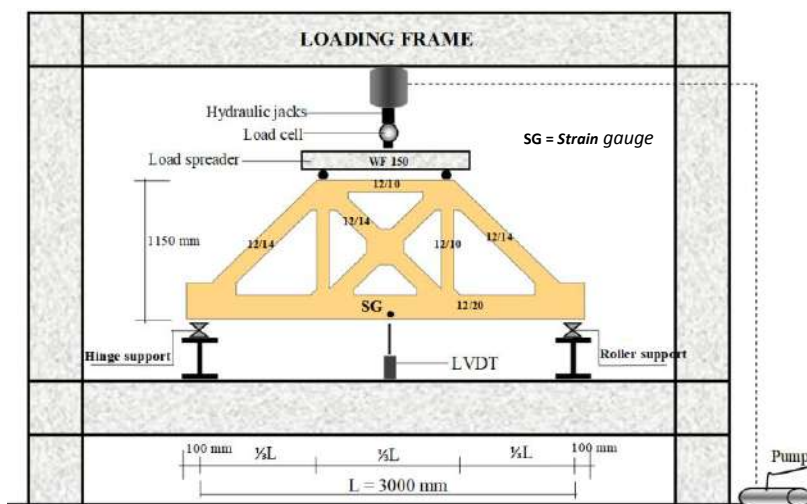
The setting of the test of bamboo reinforced concrete bridge frame
